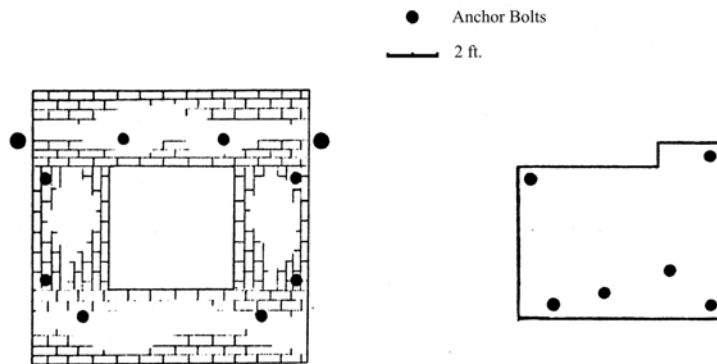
Types of hoist foundations (plan views). Single-drum steam hoists were usually bolted to foundations like the one at left, and the other foundations represent various types of gasoline hoists. Twitty, *Riches to Rust*, 178, 241.
